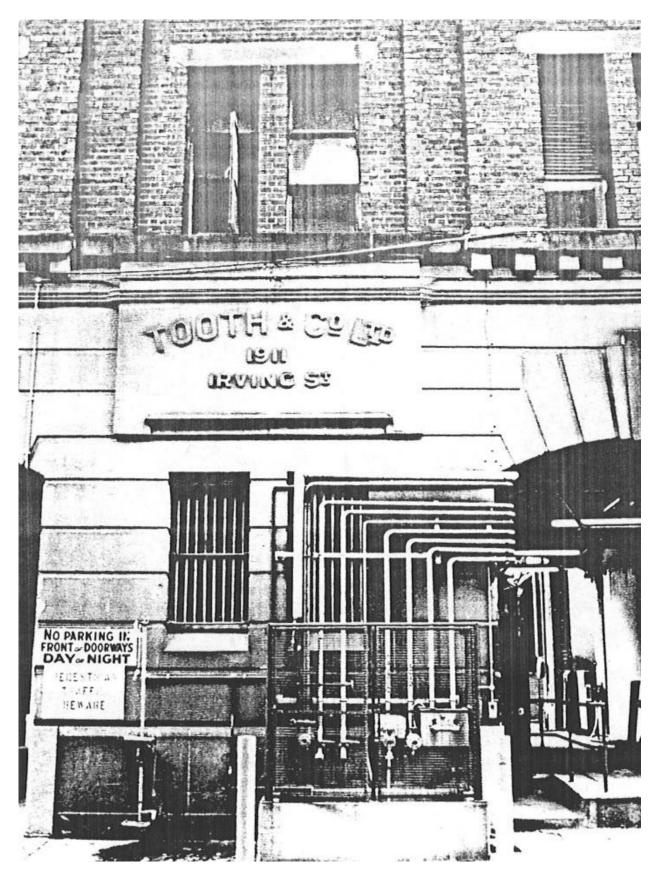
Irving Street entrance to Brewery, 1991. An example of the pipework which was added to the exterior elevations.
